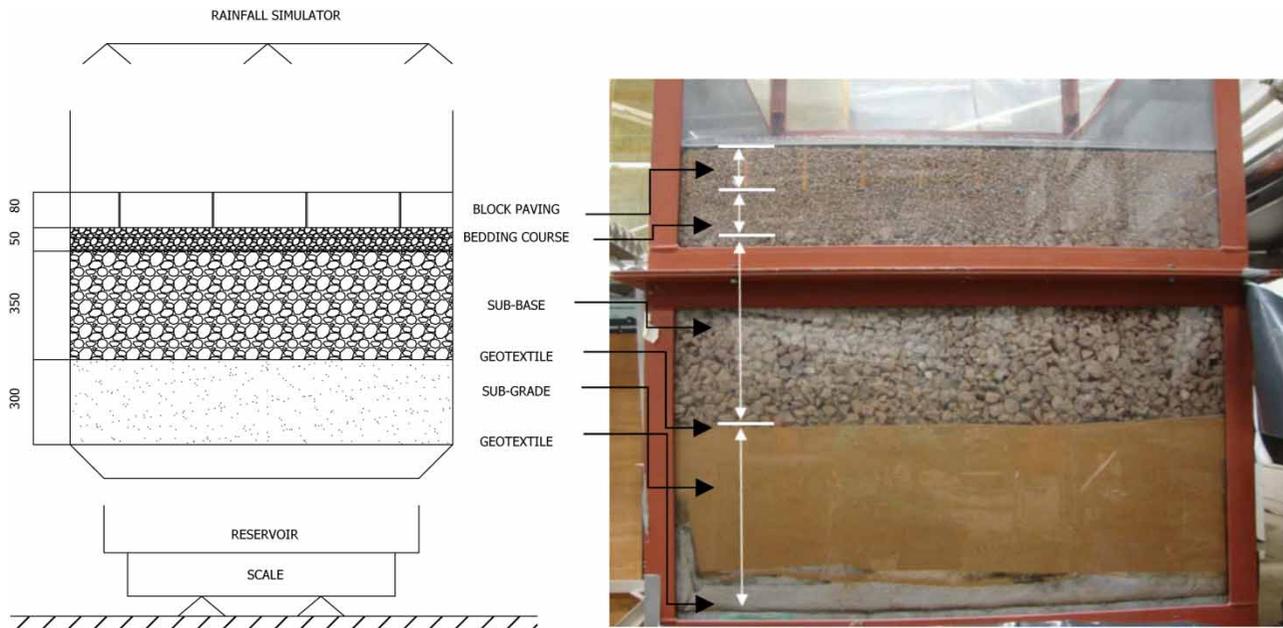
| (Left) Schematic of the vertical cross section of the rig pavement illustrating the total vertical installation. Dimensions on the vertical axis are in mm. (Right) Picture of cross section of the pavement structure (Ioannidou & Arthur 2018).
